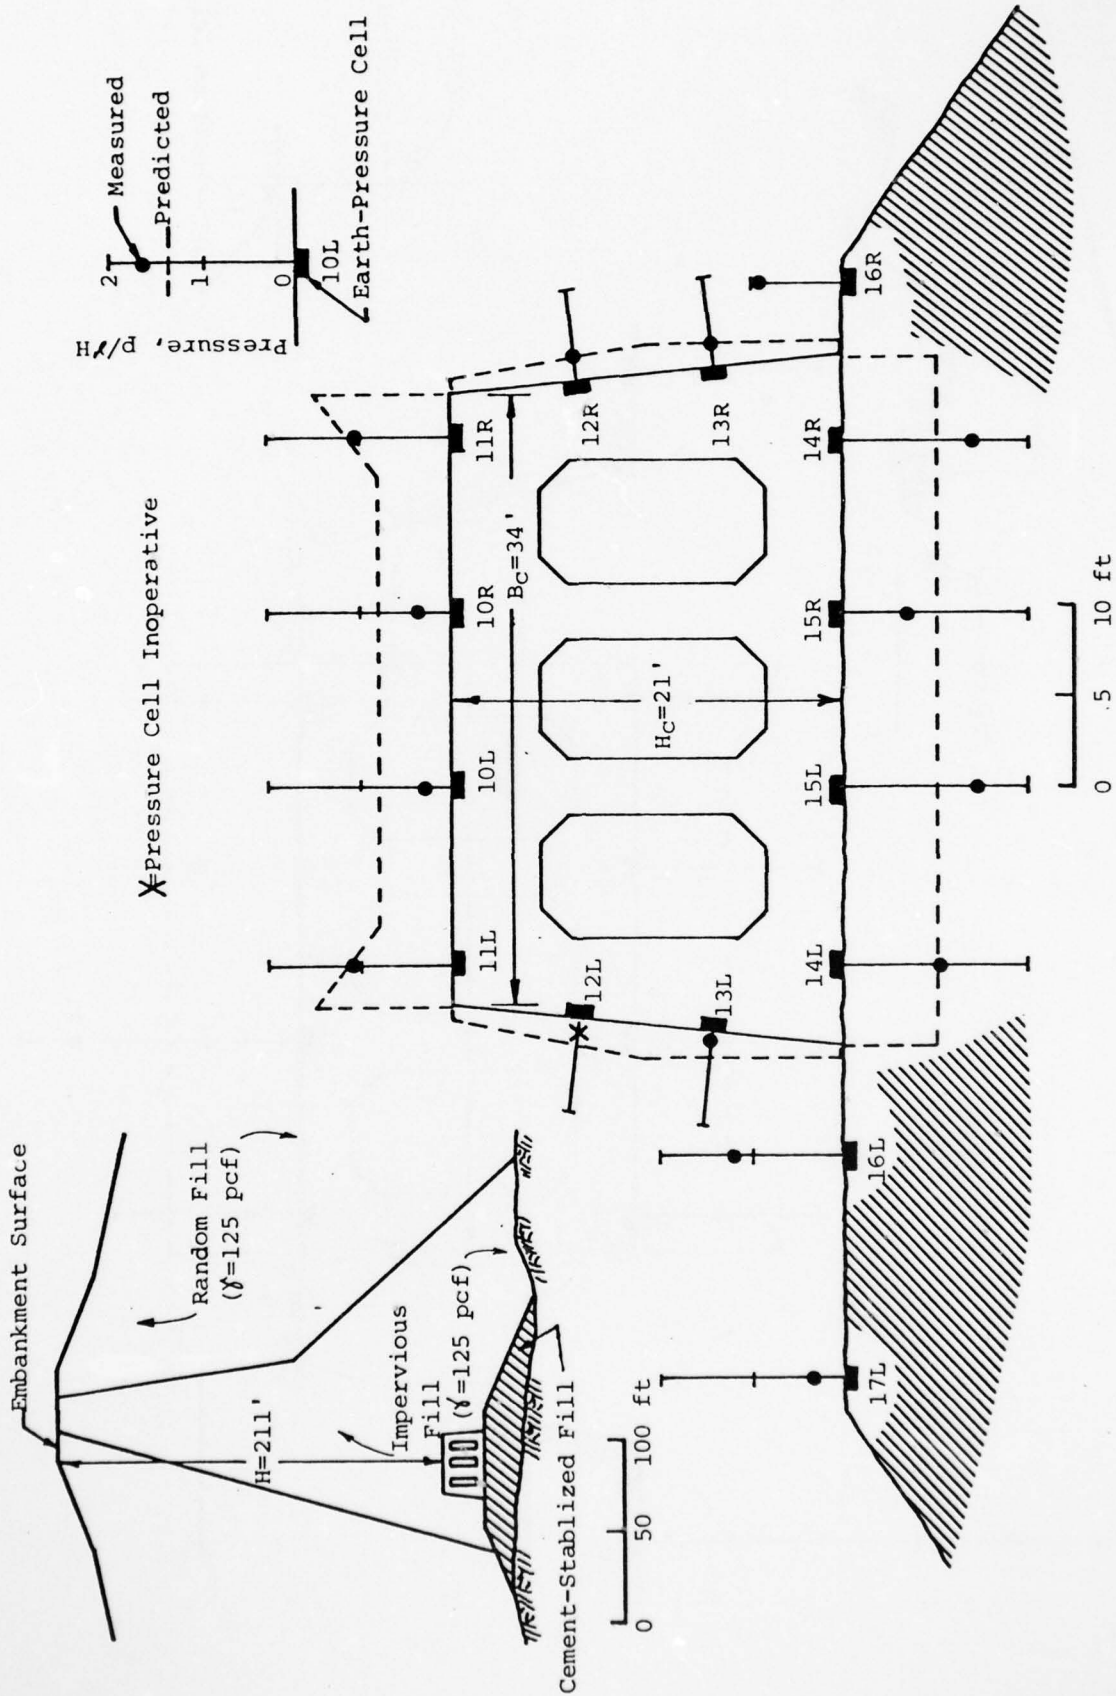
EARTH PRESSURES AT END OF CONSTRUCTION, INSTRUMENT STATION C, COCHITI DAM
